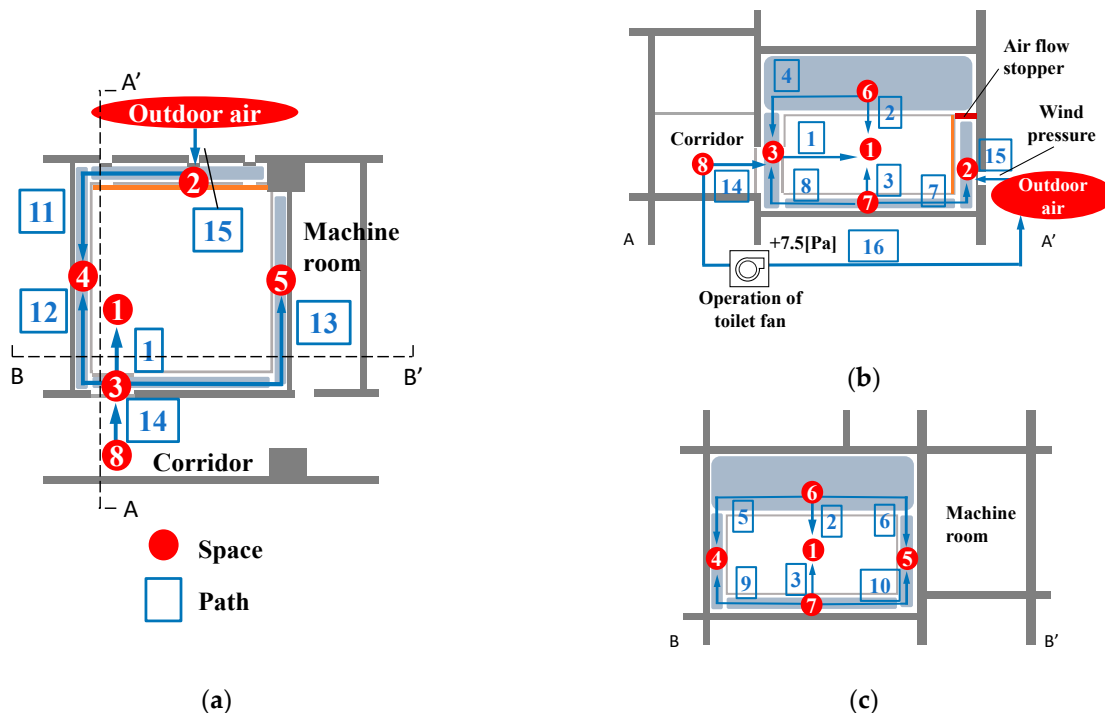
Ventilation network of the storage room: (a) horizontal section; (b) cross section A–A'; (c) cross section B–B'.
